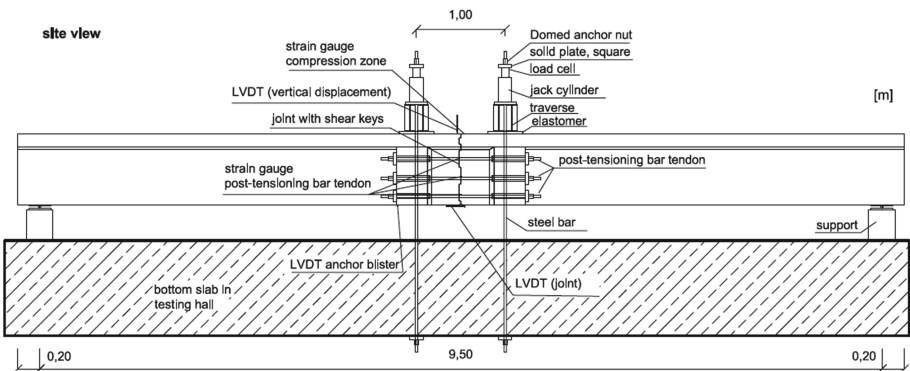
Test set-up for four-point bending tests at specimens type 1.
